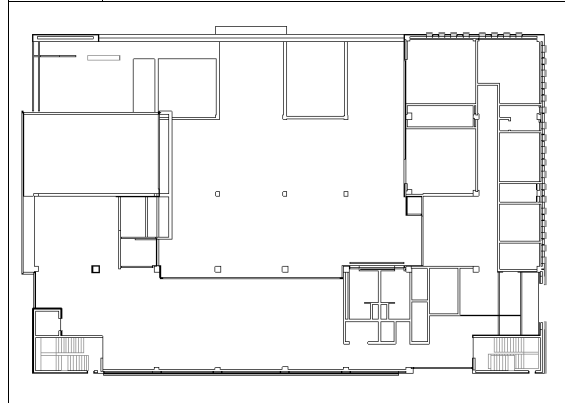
Floor Plan of Gunpo Worker's Welfare Centre
